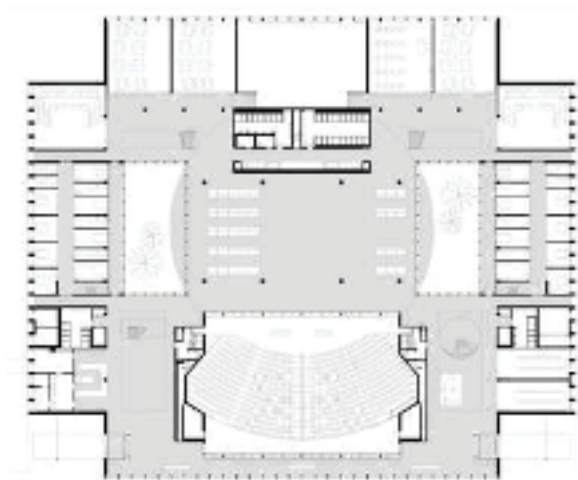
Cube, Tilburg, Netherlands, Floor Plan.
